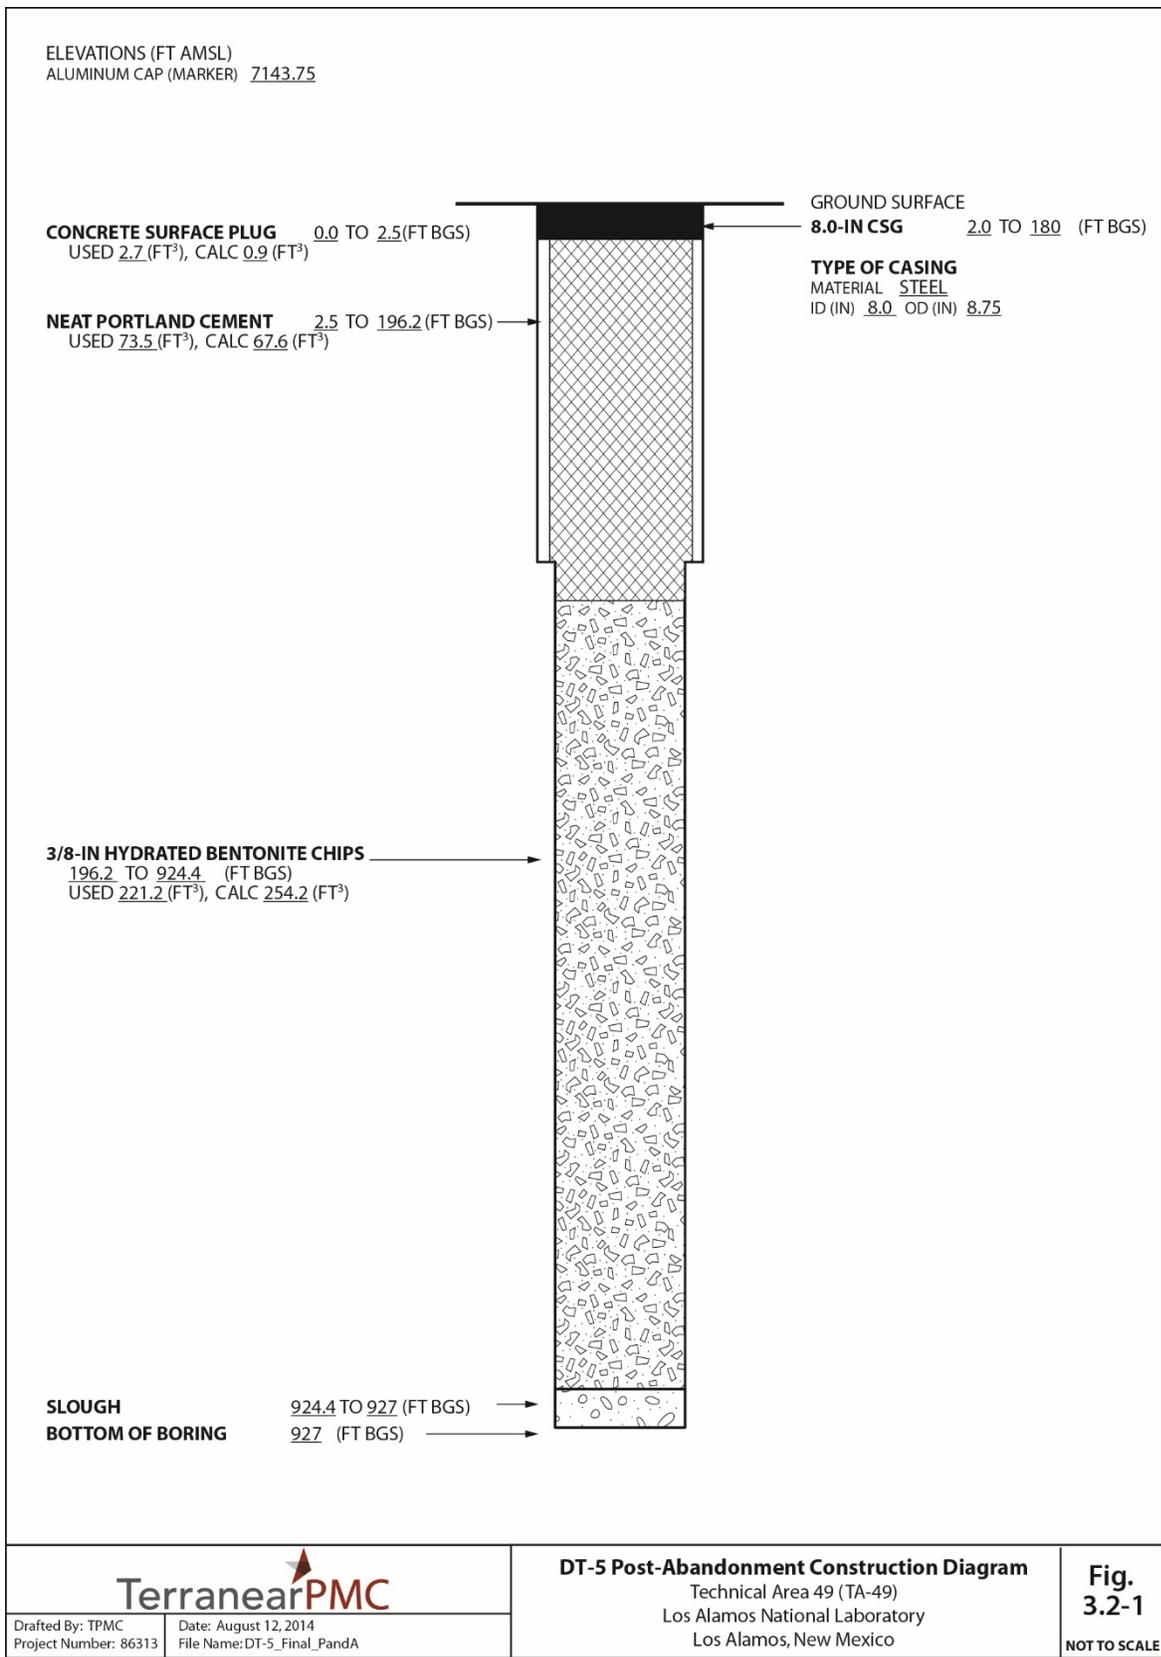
Test well DT-5 post-abandonment construction diagram
